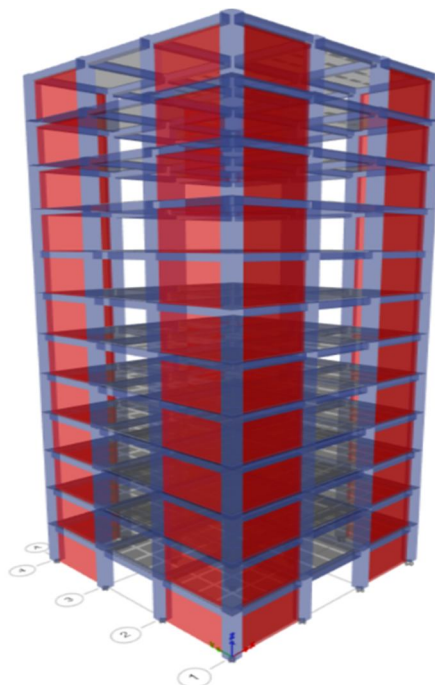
3D View of Structure and Arrangement of Shear Wall.
